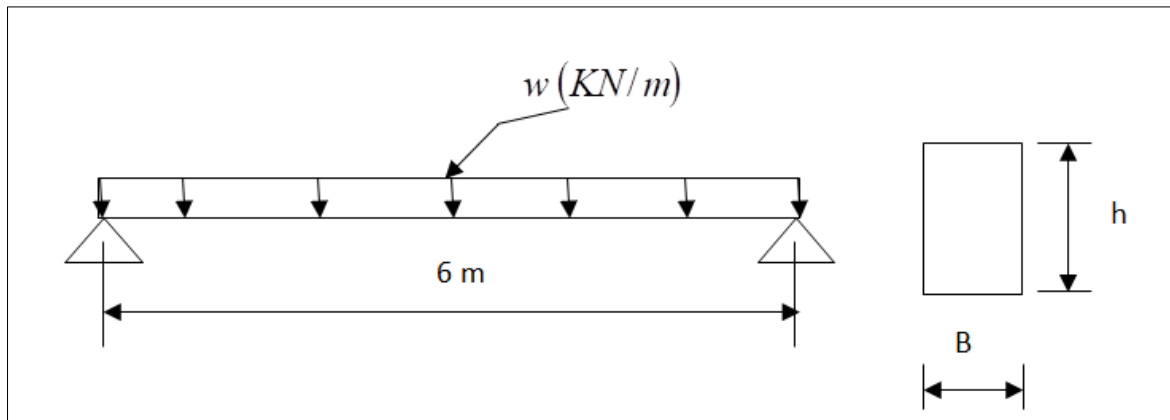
A simply Supported Solid Timber Bridge Beam under Uniform
